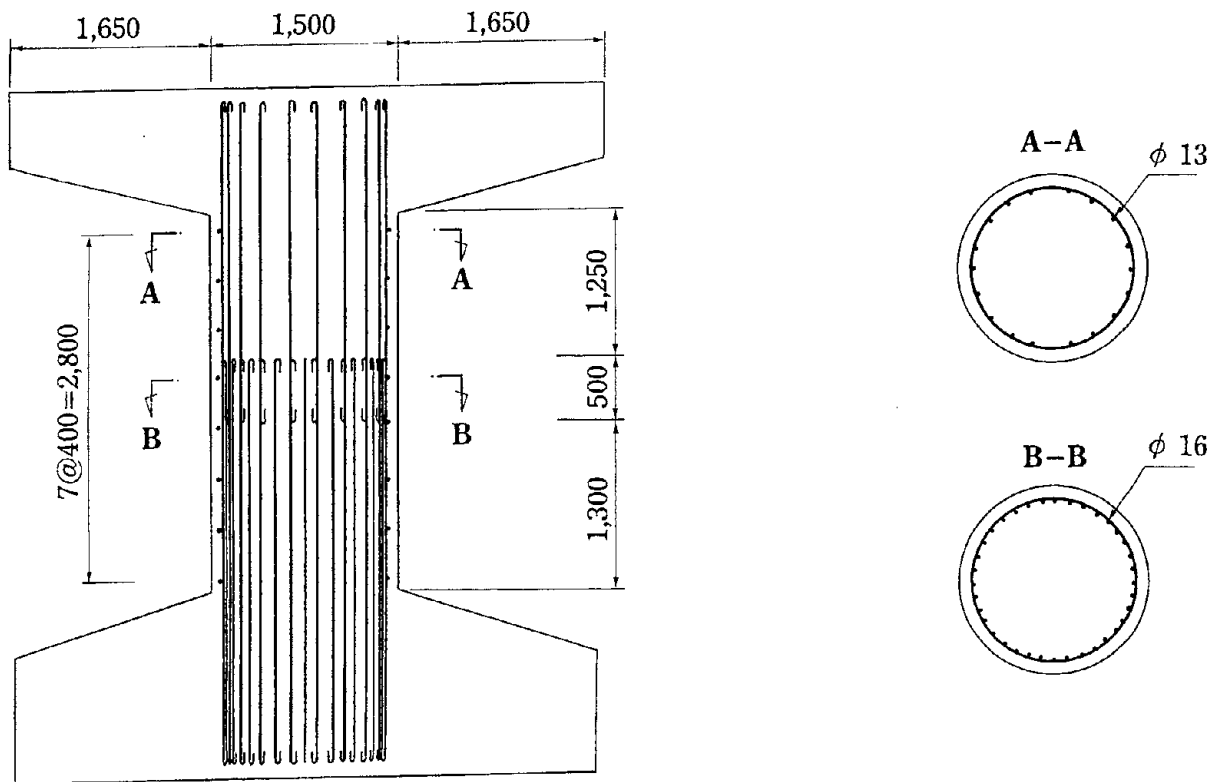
Layout of Longitudinal Reinforcement in Motouriya Bridge Pier
